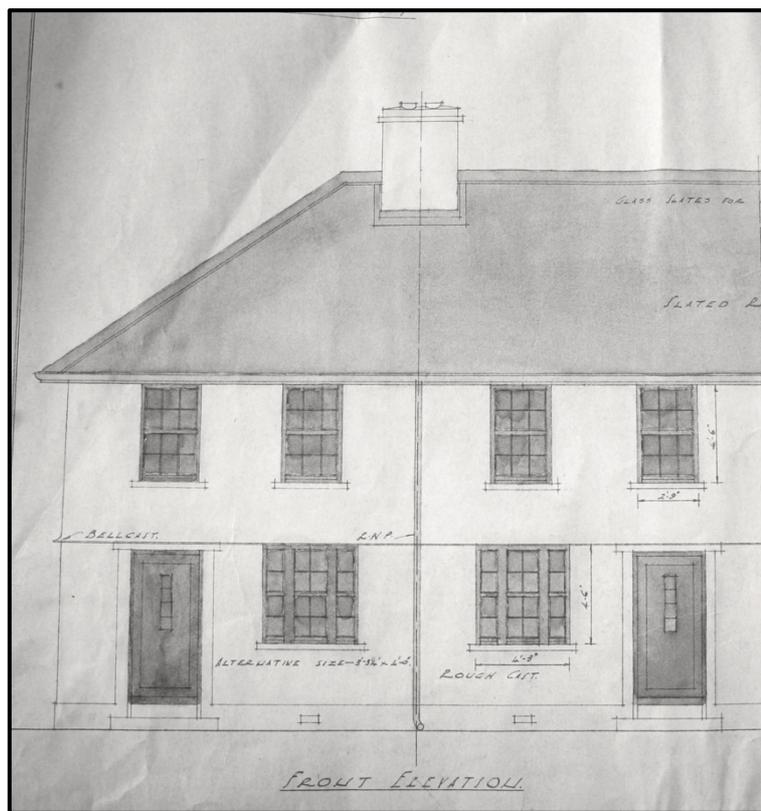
Elevation of 'better-class' house at Temple Street, Sligo, 1933, as drawn by the architects. Source: Sligo Borough Council, courtesy of Sean Martin, borough architect.
